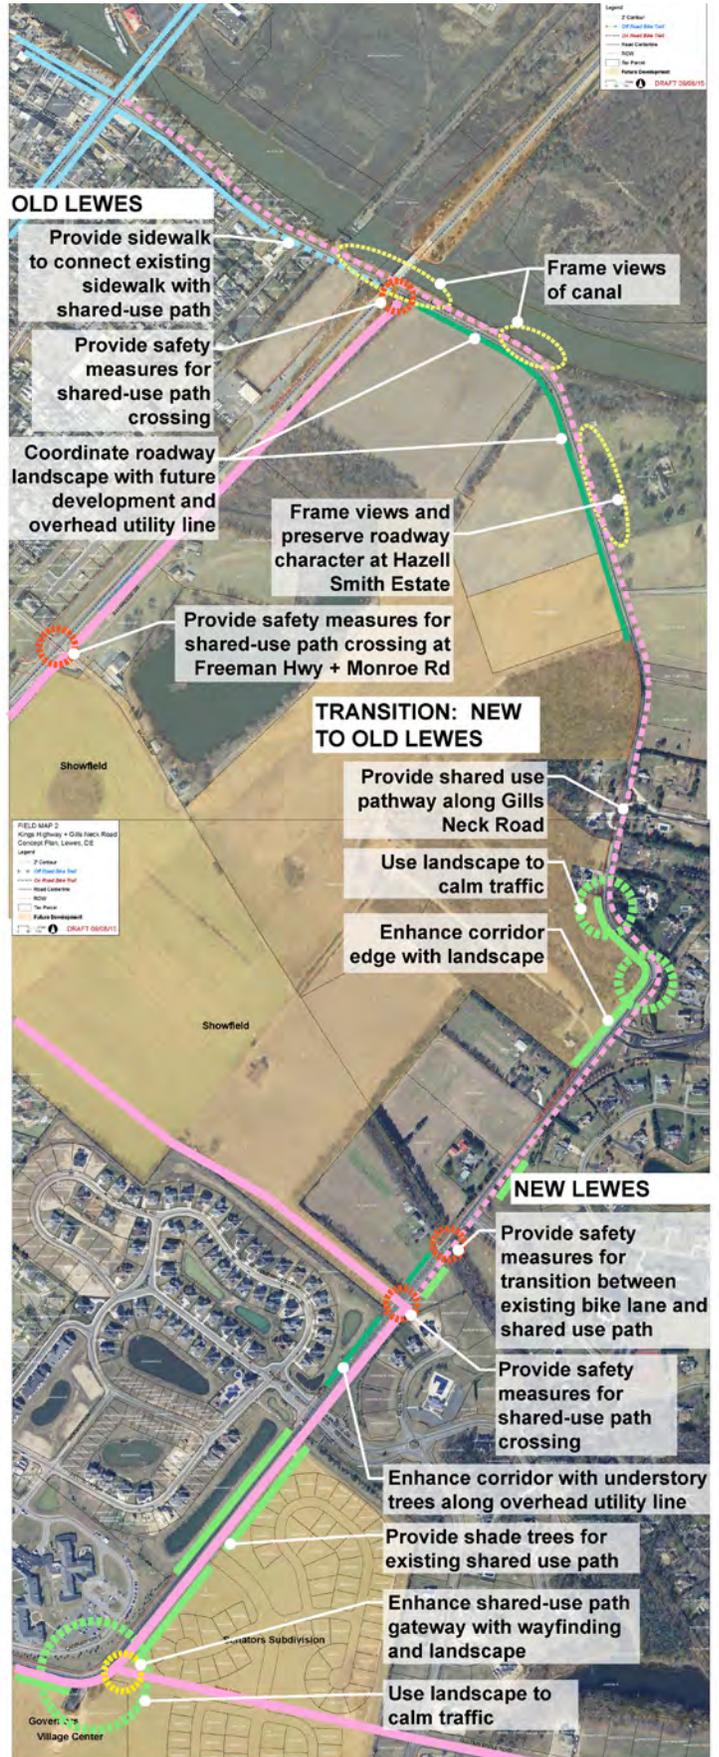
Preliminary Concept Plan for Gills Neck Highway. The concept plan as presented in initial public meeting highlights key areas for improvements along the corridor. (An 11x17 copy of the display may be found in the appendix.)
